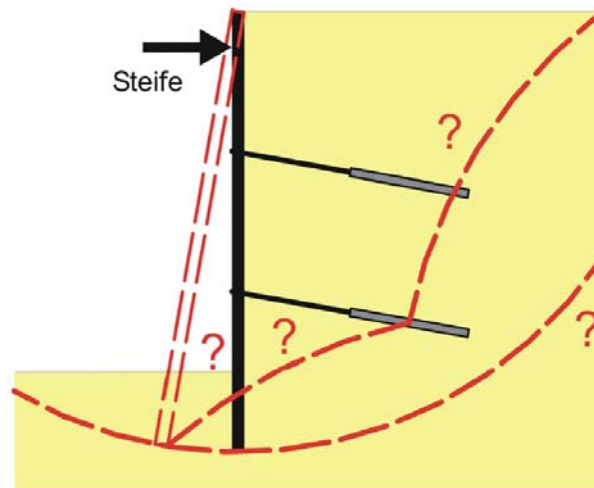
Failure mechanism of an anchored sheet pile wall with additional struts [19]
